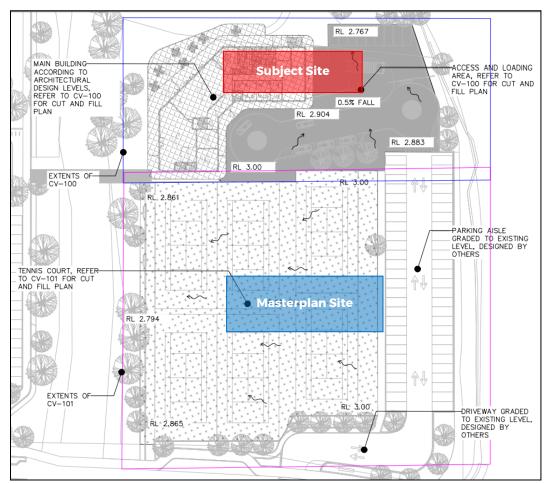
Civil Design Master Plan (Source: Stellen Consulting, 2022)
